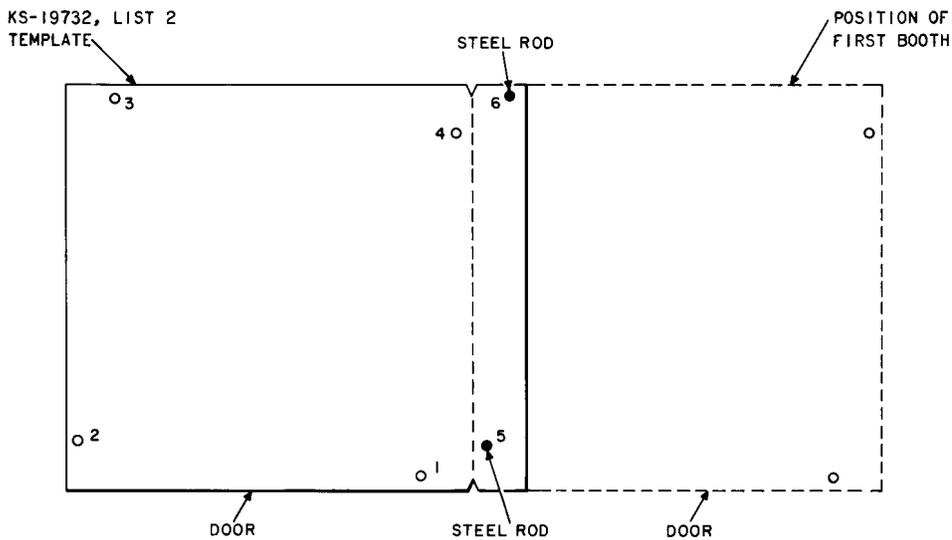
Right to Left Layout for Drilling Mounting Holes
